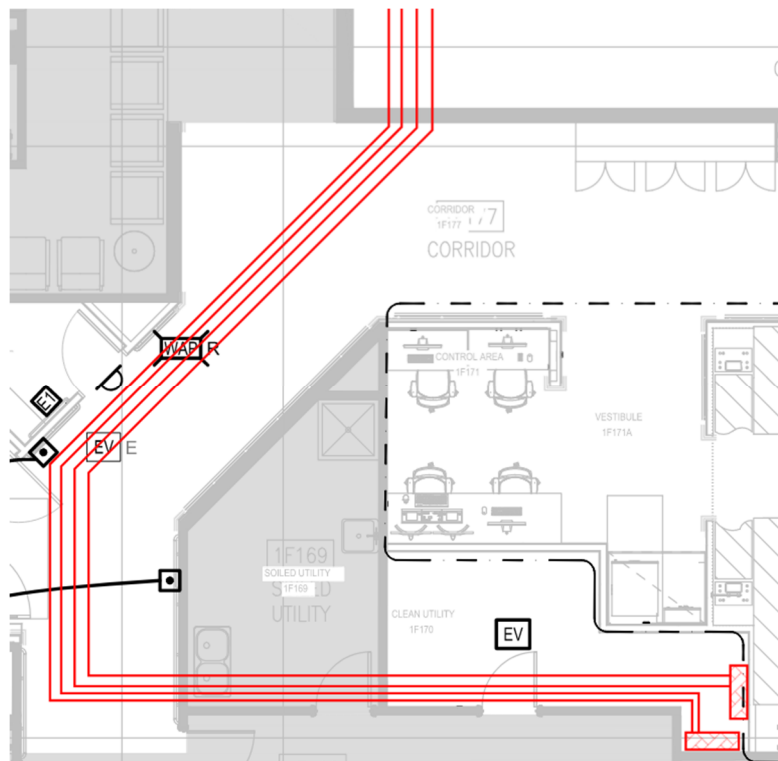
Proposed conduit runs from junction box through ceiling space
